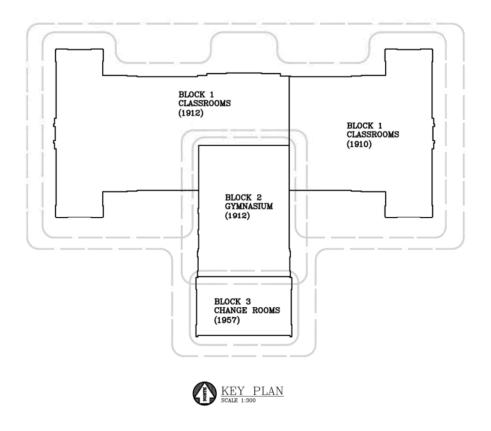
Key Plan for Lord Tennyson Elementary School
